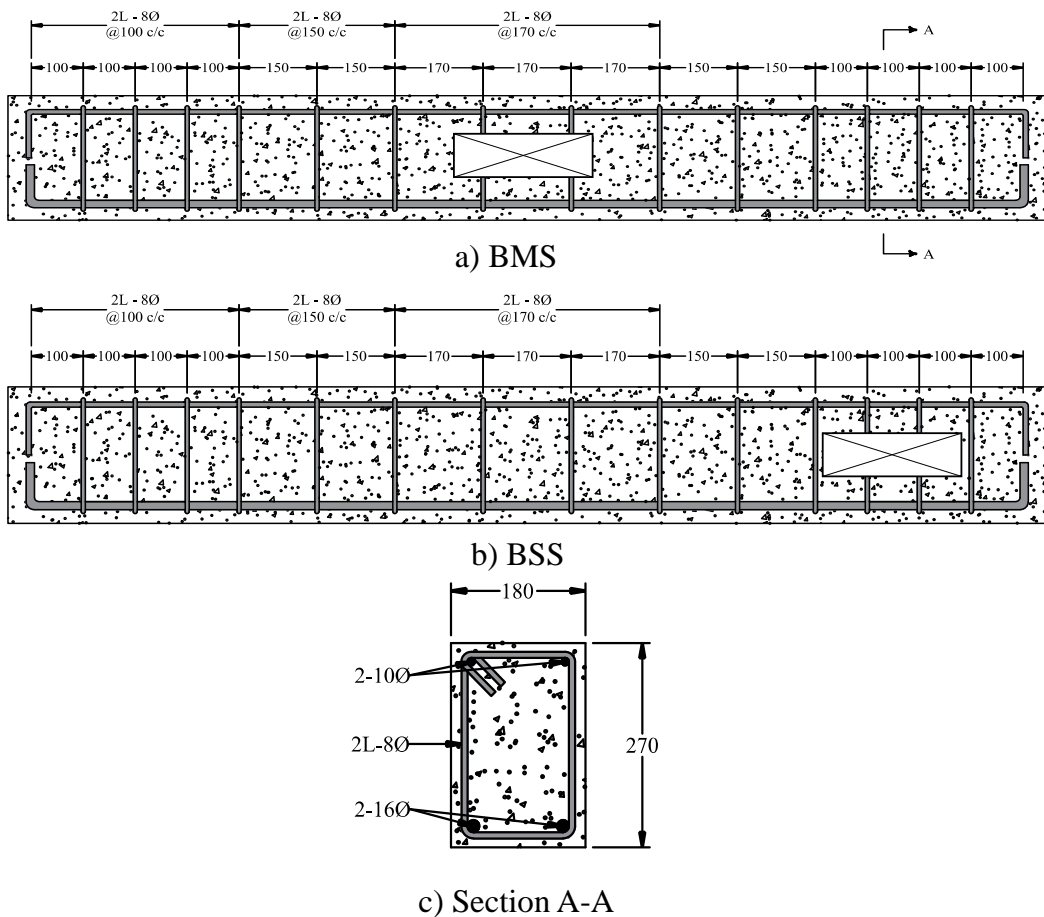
Detail of the Reinforced concrete specimen for Jacketing work
